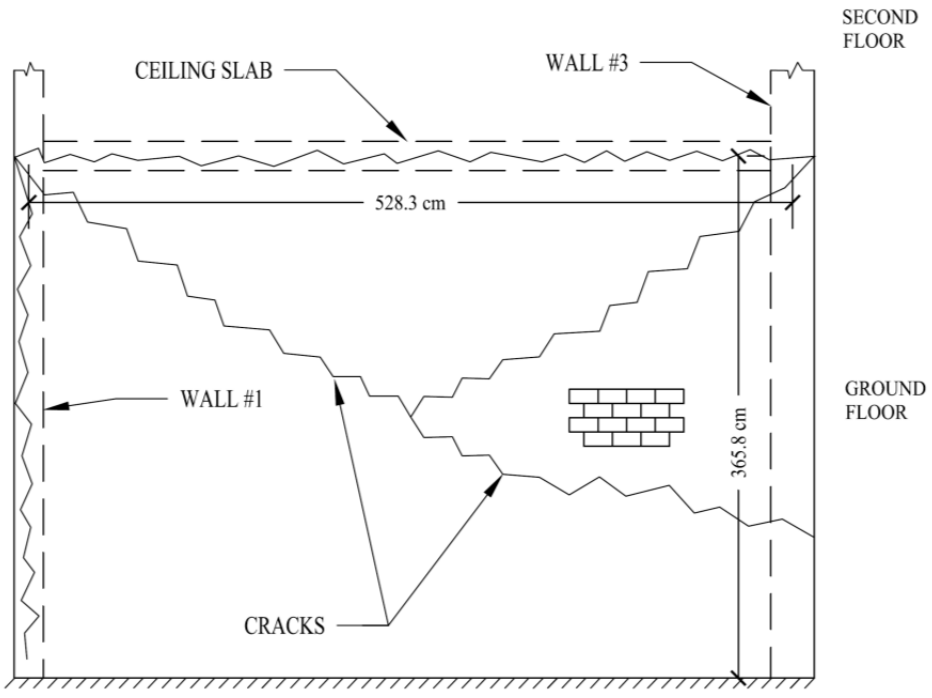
Post-test crack pattern of smaller bearing wall (Wall #2) at ground floor level, outside blast chamber looking in.
